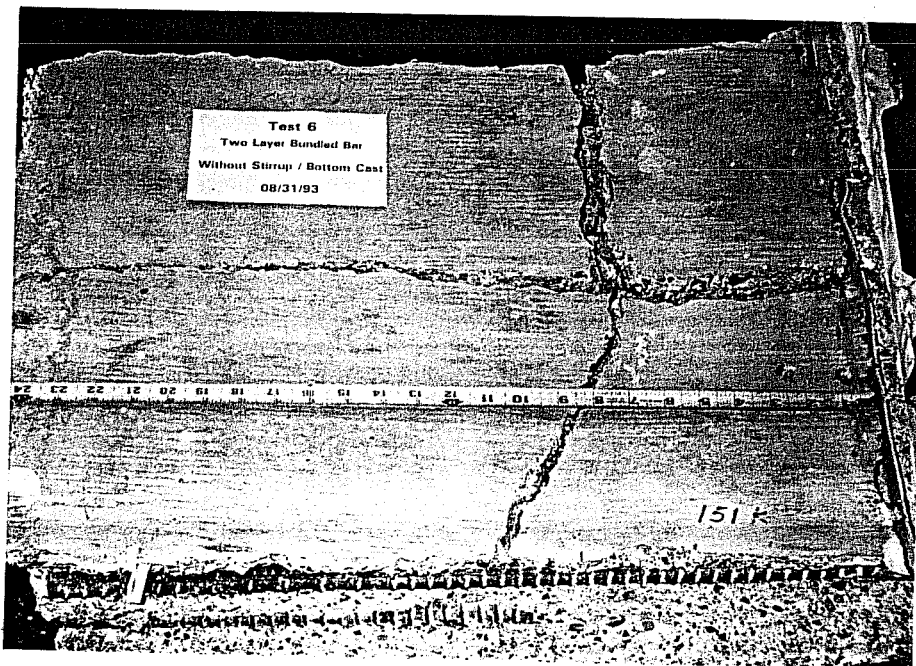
Failure mode of two layers of bundled bars without transverse reinforcement (Test 6 2-24-NS-B)
